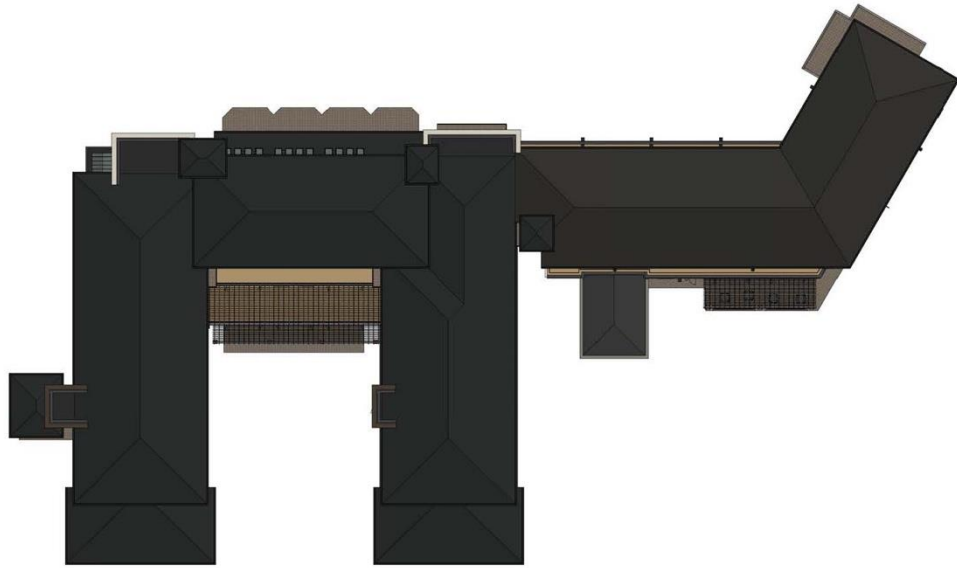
The roof plan of Building B01 (Ryman Drawing A1-030 RC15).
